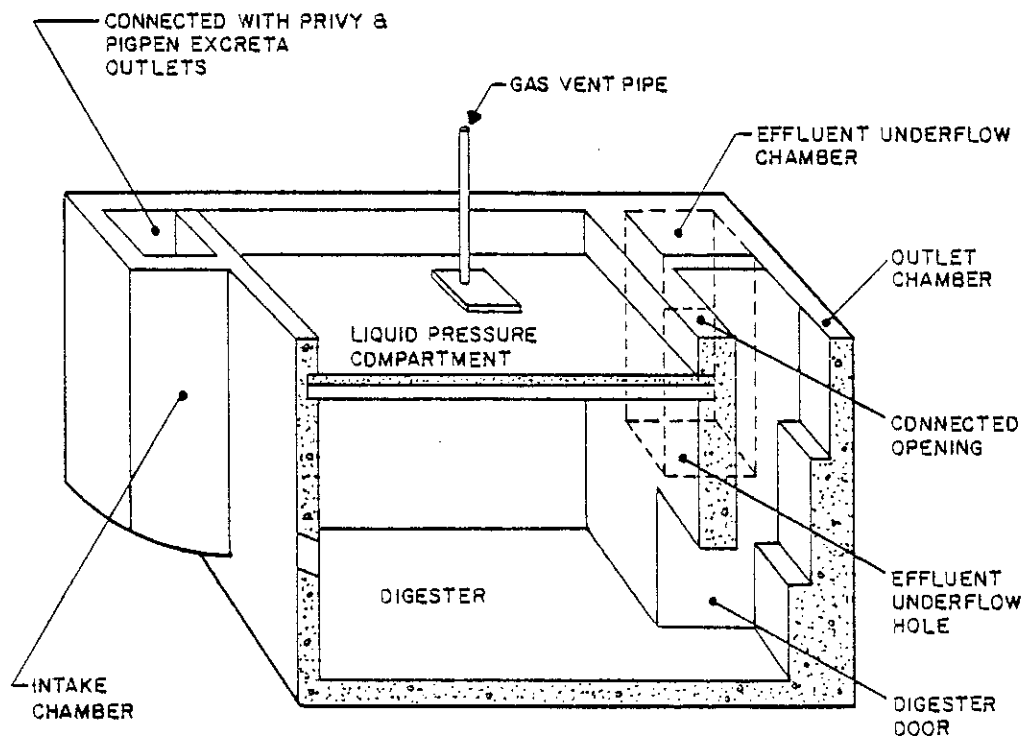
ENCLOSED BIOGAS PLANT SECTION
